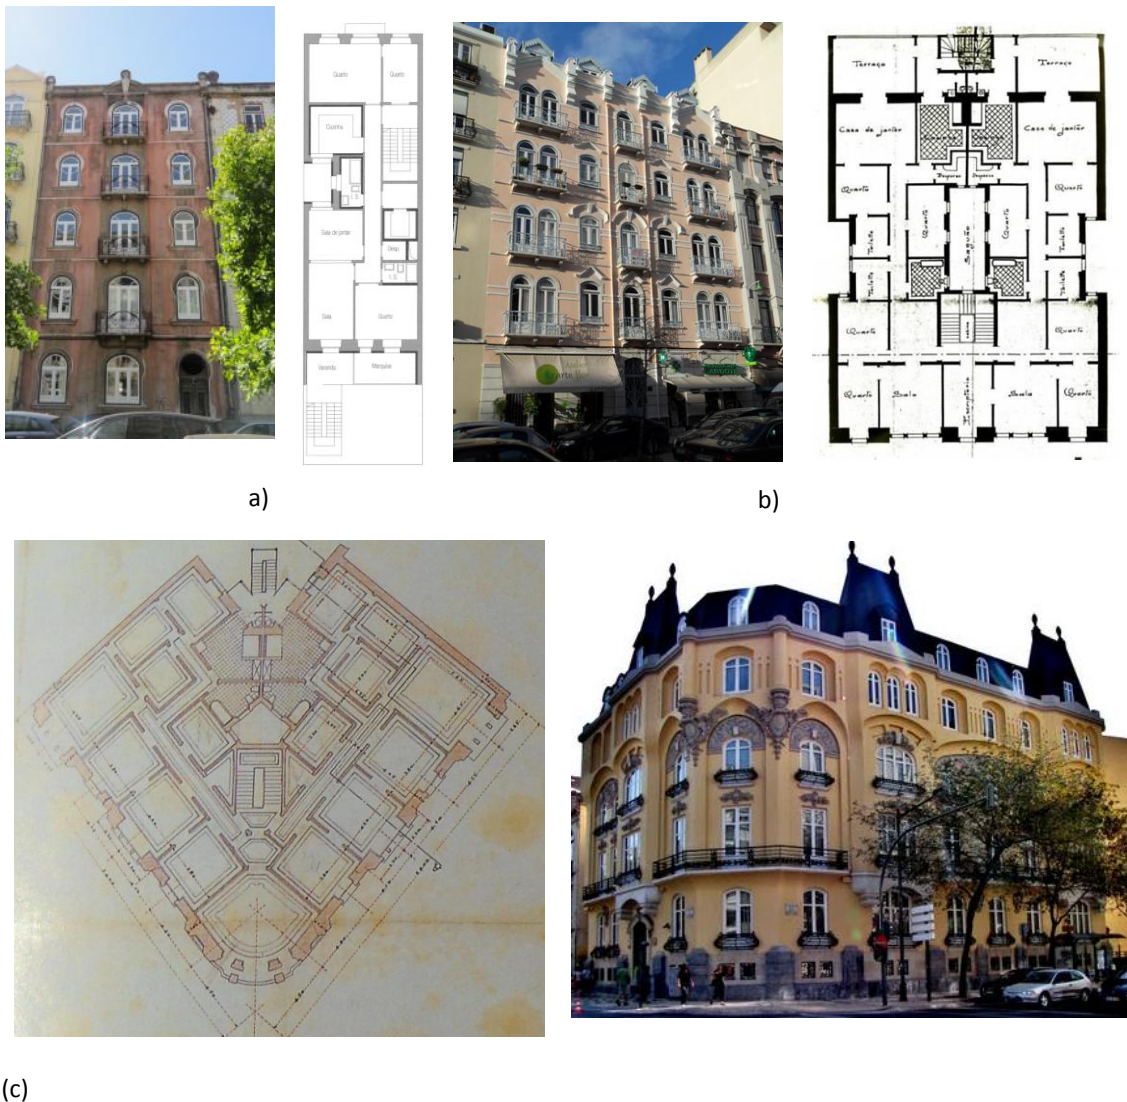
Plan of different types of *gaioleiro* building. a) Narrow front façade (one apartment per floor); b) Wide front façade (example with two apartments per floor); c) Corner building. (Adapted from Andrade (2011)).
